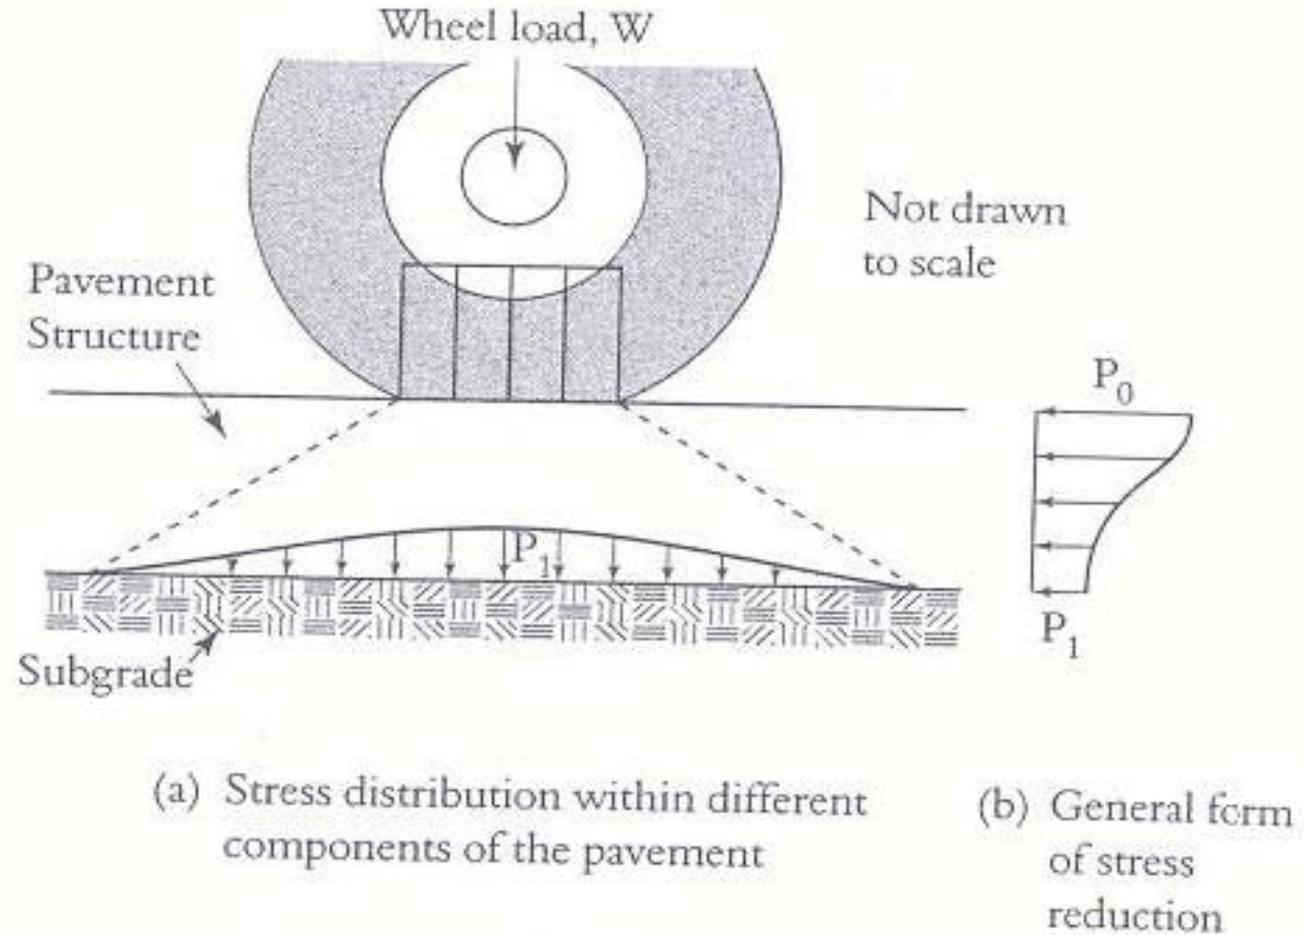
Spread of Wheel Load Pressure Through Pavement Structure
